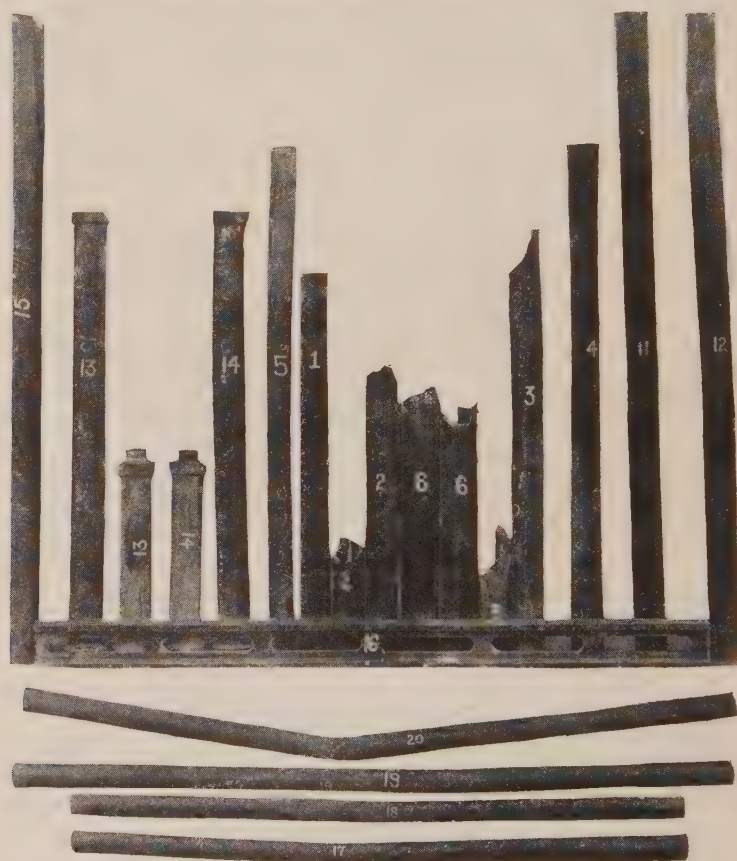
CAST-IRON CORES TO CONCRETE COLUMNS AFTER THE COLUMNS HAD BEEN TESTED.
